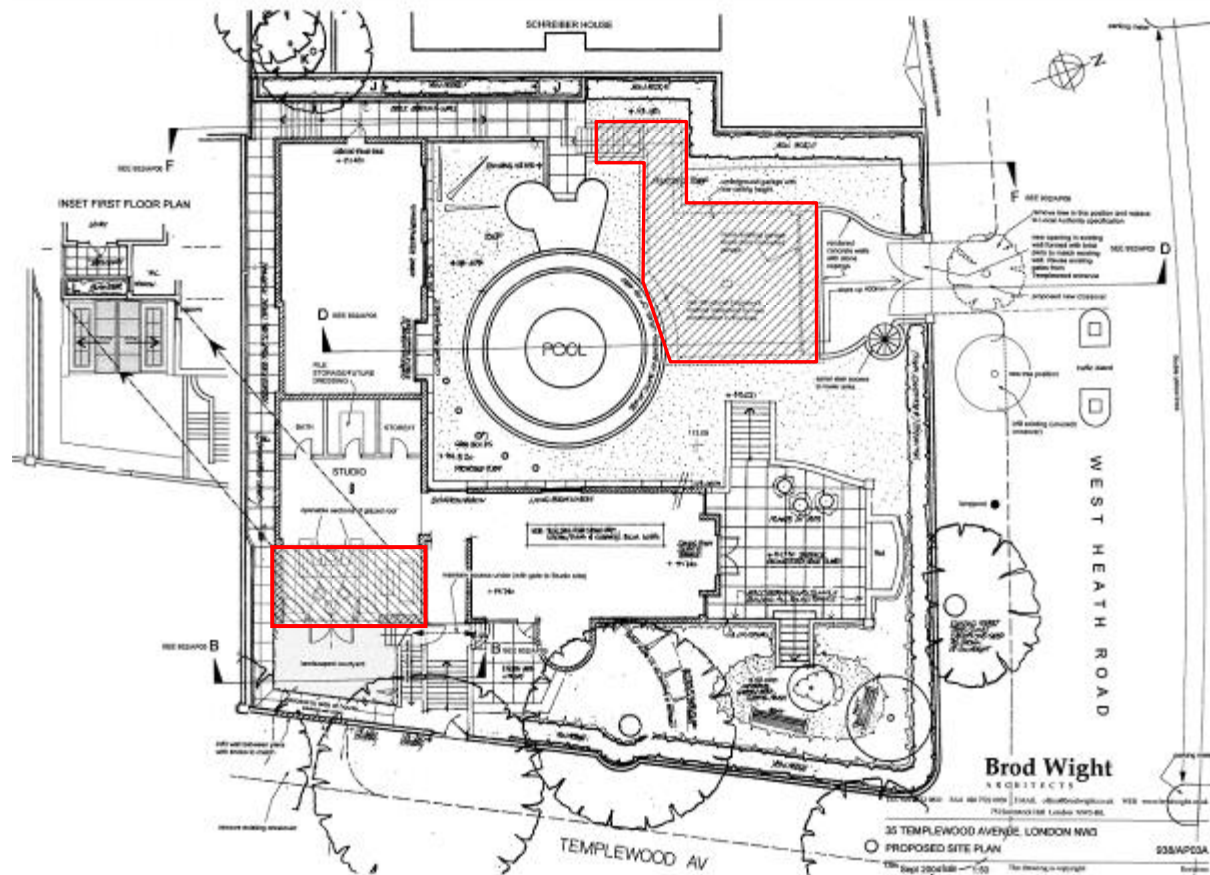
Proposed site plan for applications No 2004/3604/P & 2004/3607/L.
